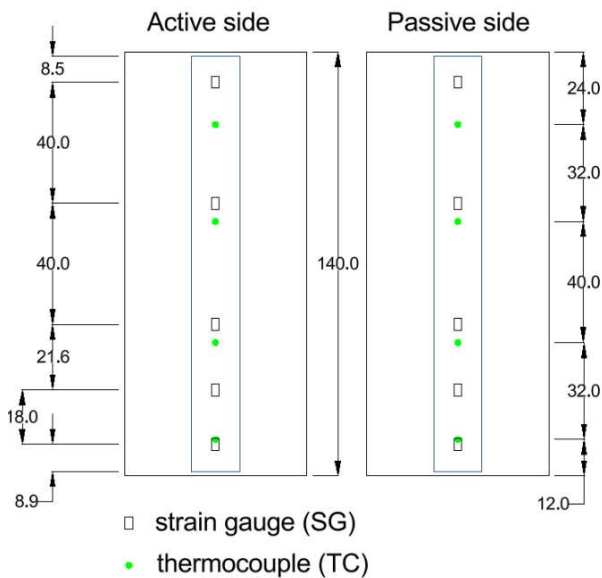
Schematic showing positions of instrumentation in a wall panel (all dimensions in mm).
